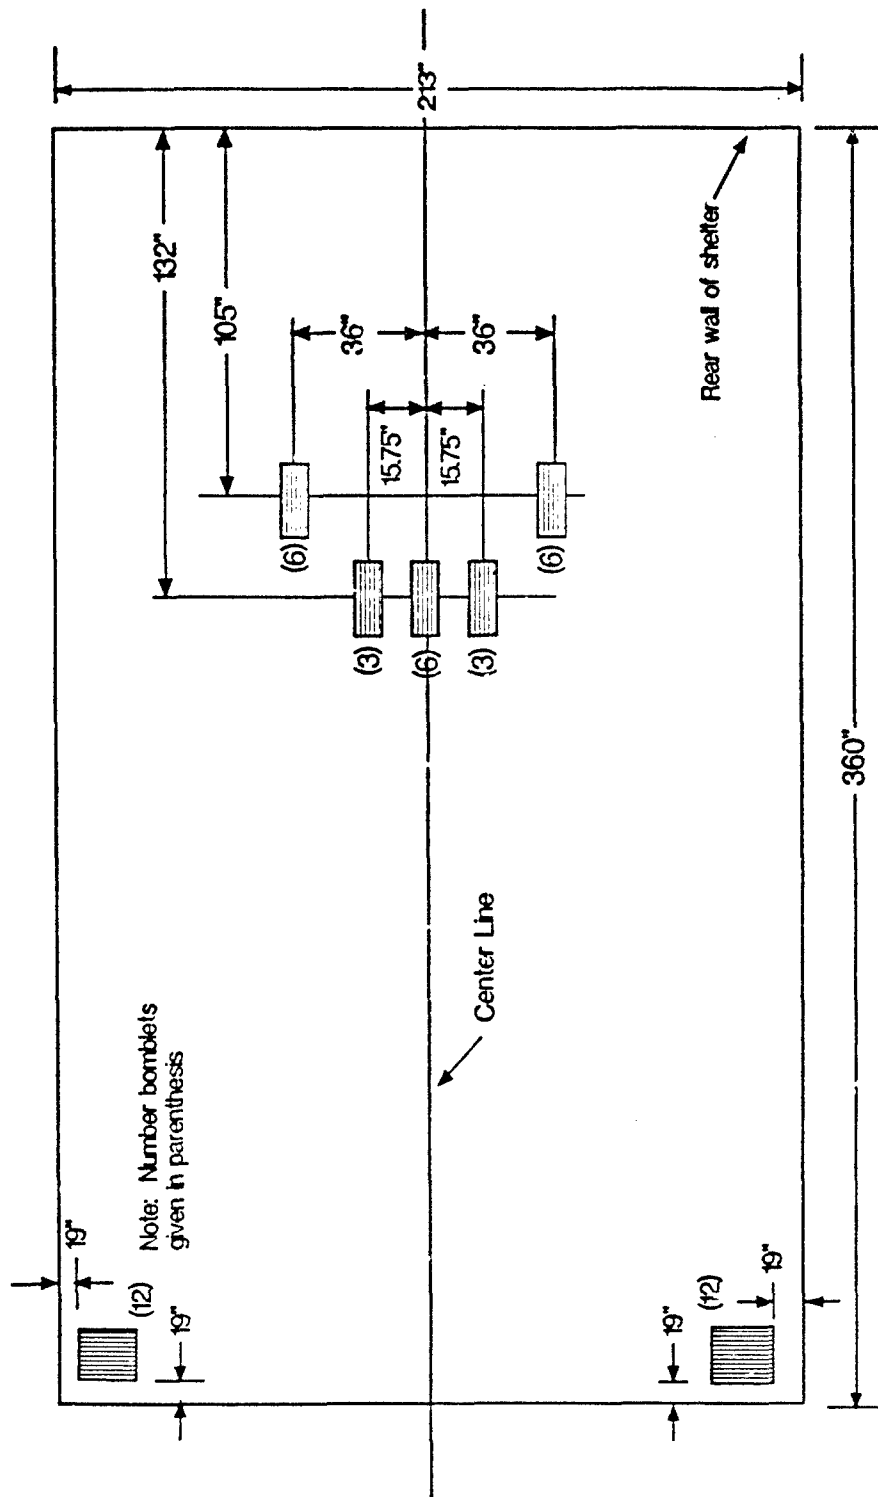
PLAN VIEW OF QUARTER-SCALE MODEL SHOWING BOMBLET LOCATIONS
